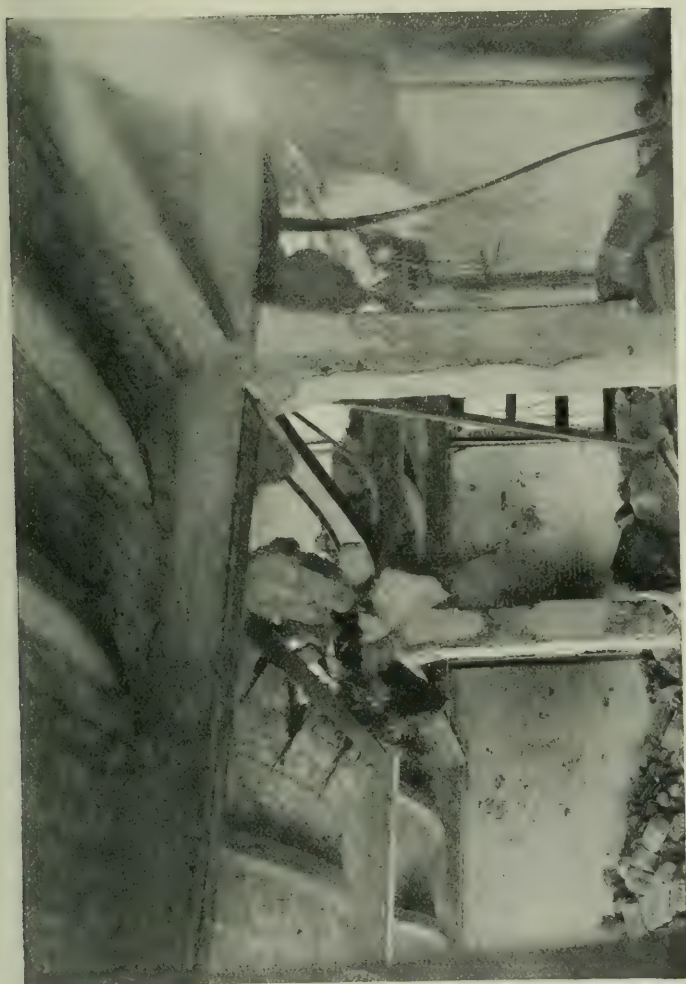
Third Floor, Ætna Building, San Francisco, illustrating defective Floor Design in Exposure of Reinforcing Metal.
